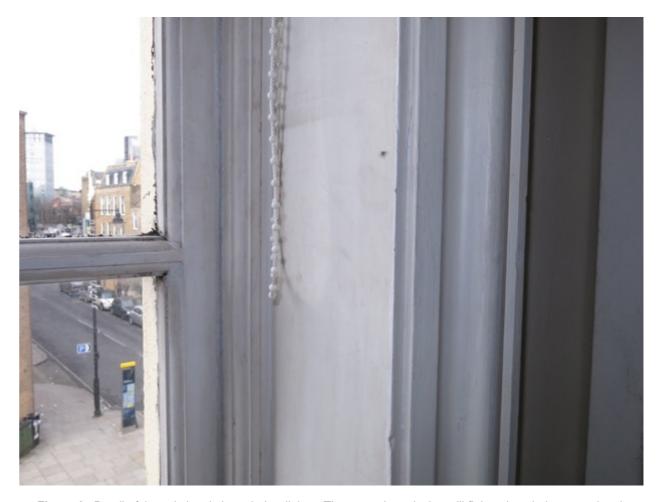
Detail of the existing timber window lining. The secondary glazing will fit into the window reveal and screw fix to these window linings
